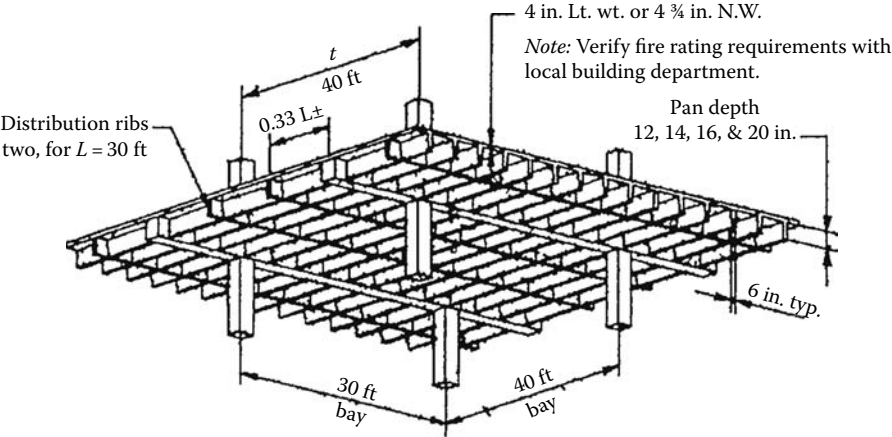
Beam and slab system 30 ft × 40 ft bays.
